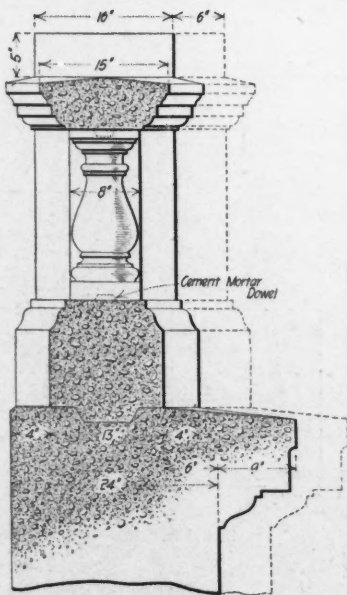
Detail Cross-Section of Balustrade for Single-Span Arch.
